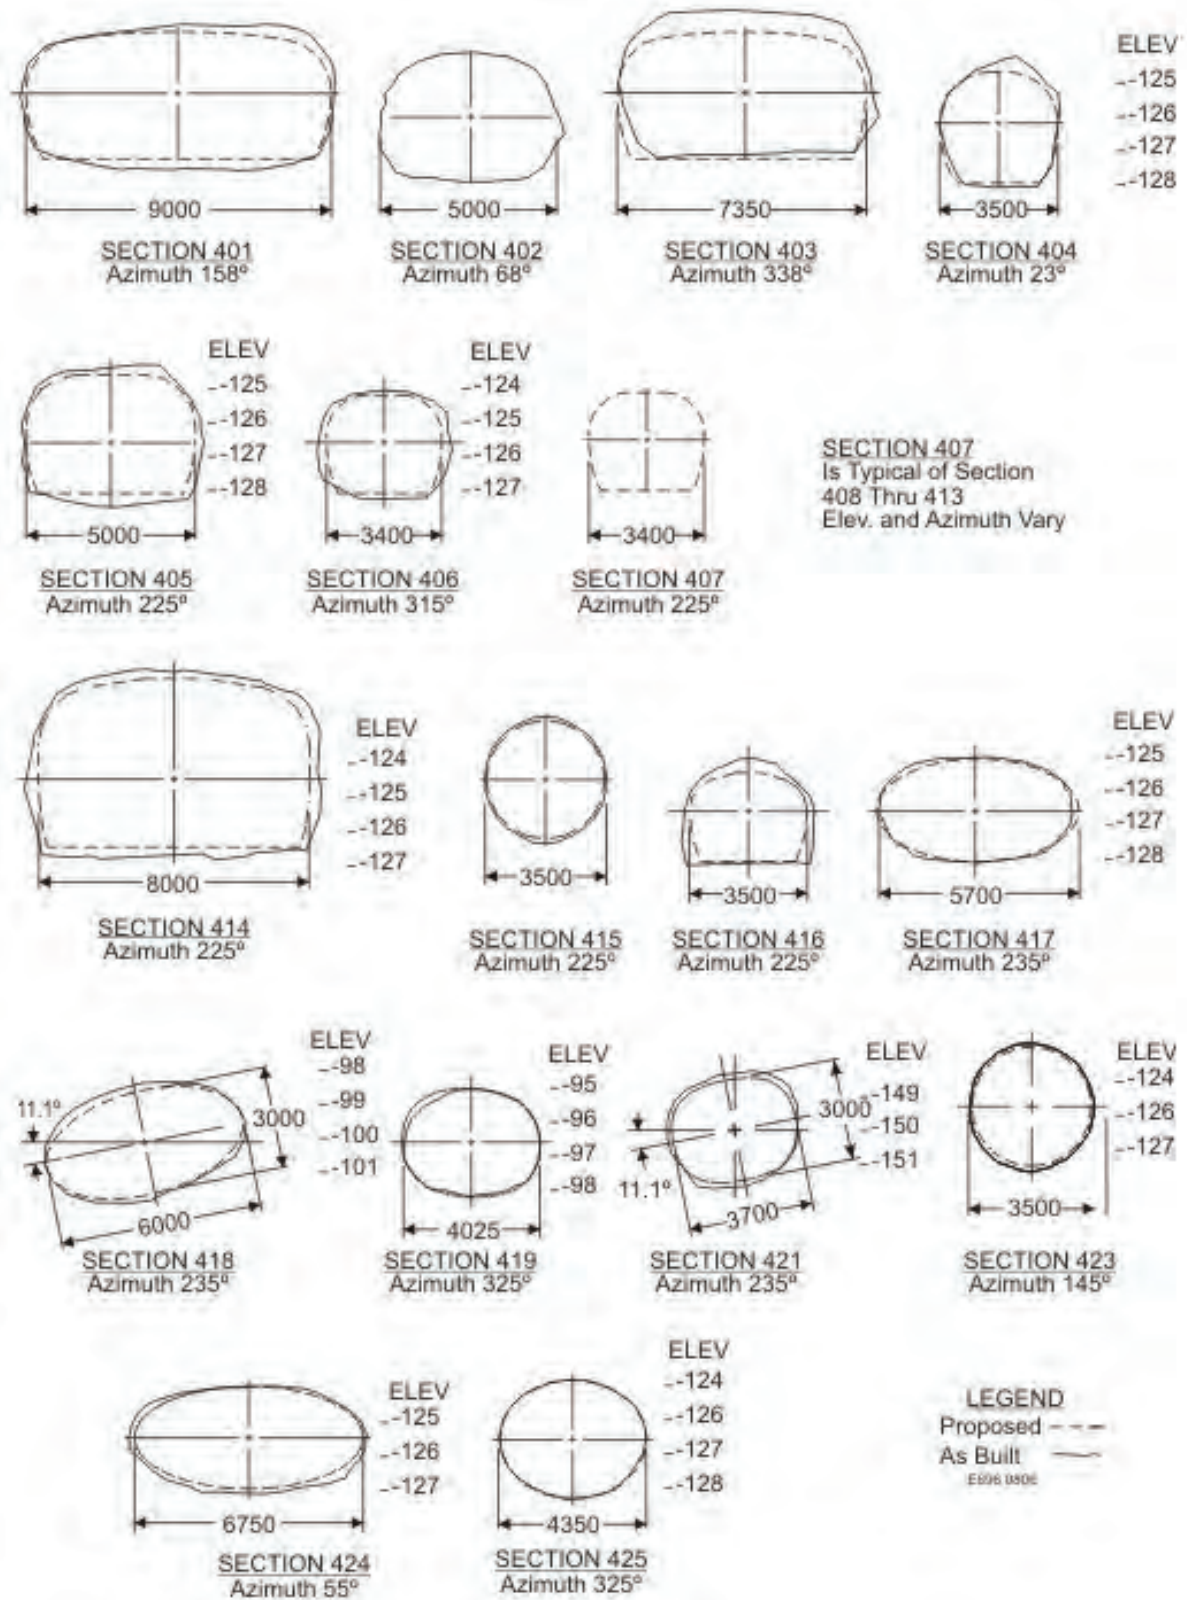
420 Level Room Shapes. Elevations are above mean sea level. URL Shaft collar is at 289.9 m elevation.
